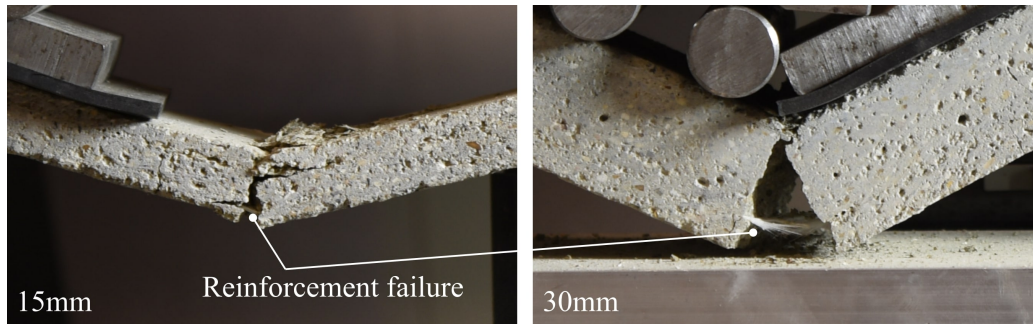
Failed regions TRC specimens after testing in four-point bending, showing tensile rupture and pull-out of reinforcement.
